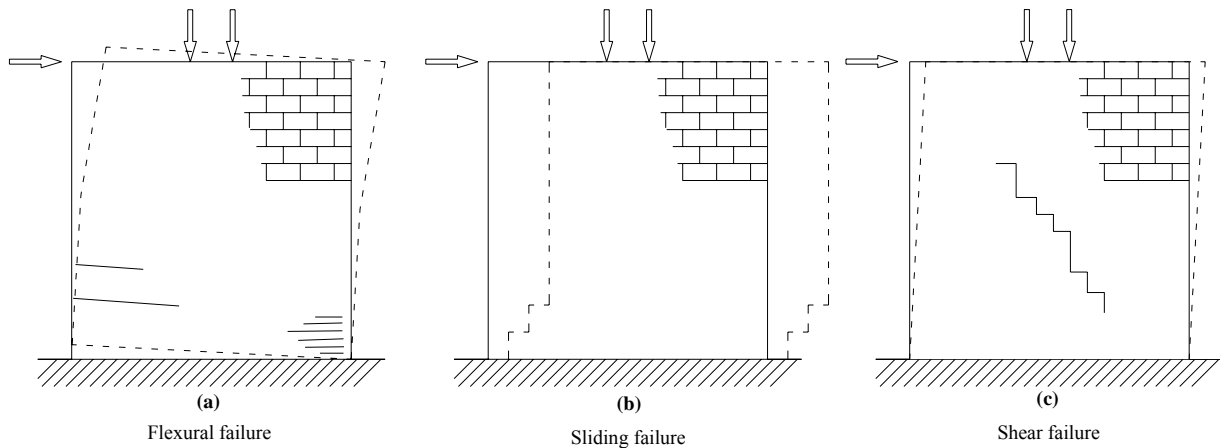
Reinforced masonry shear wall failure modes.
